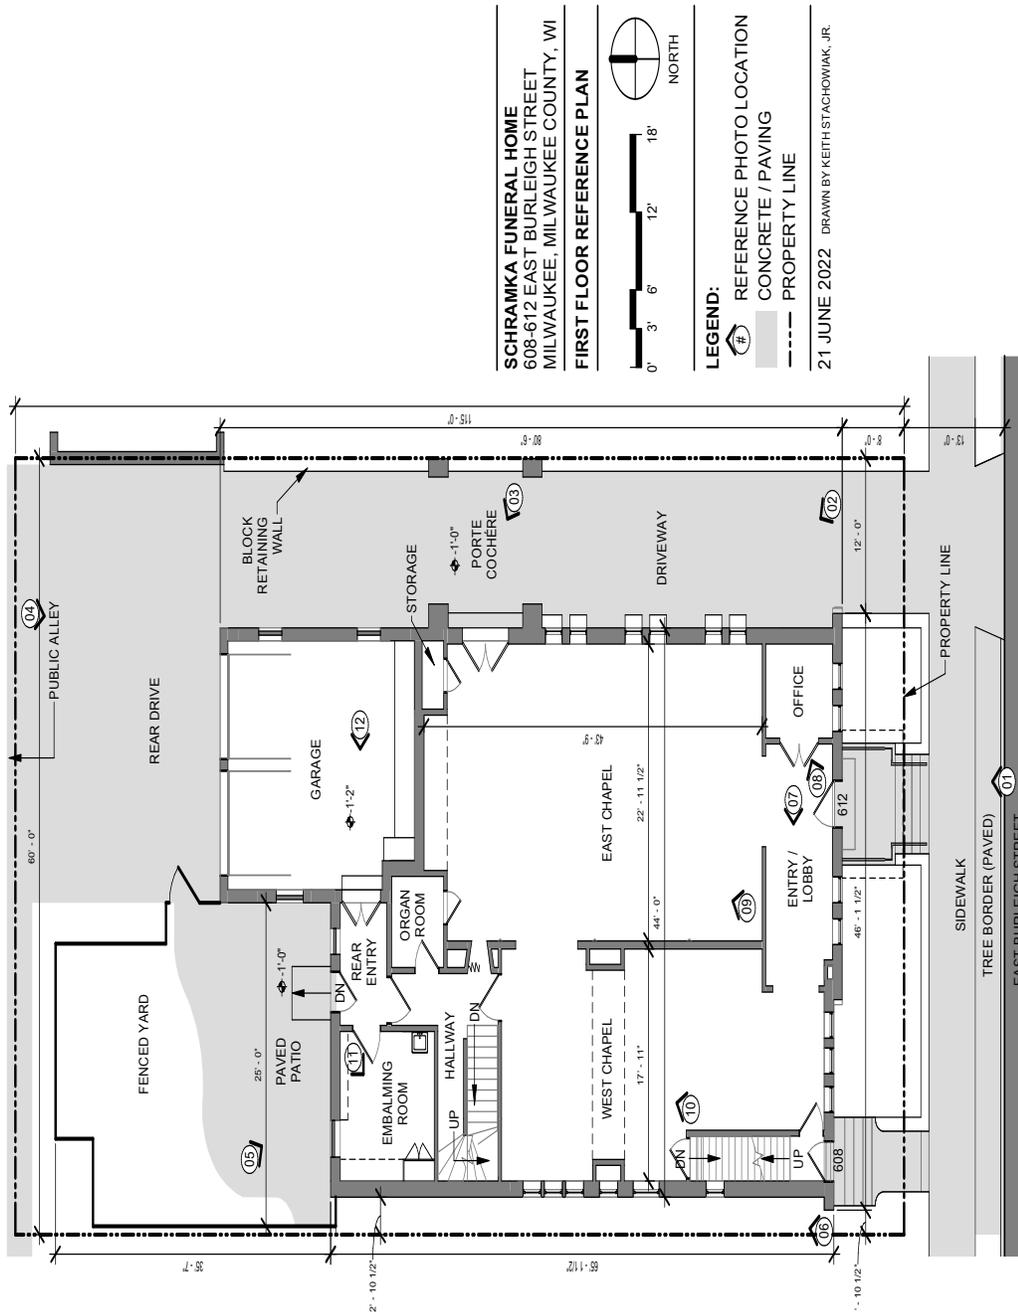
Figure B: First Floor Plan (Drawing by Keith R. Stachowiak, Jr., Owner).
